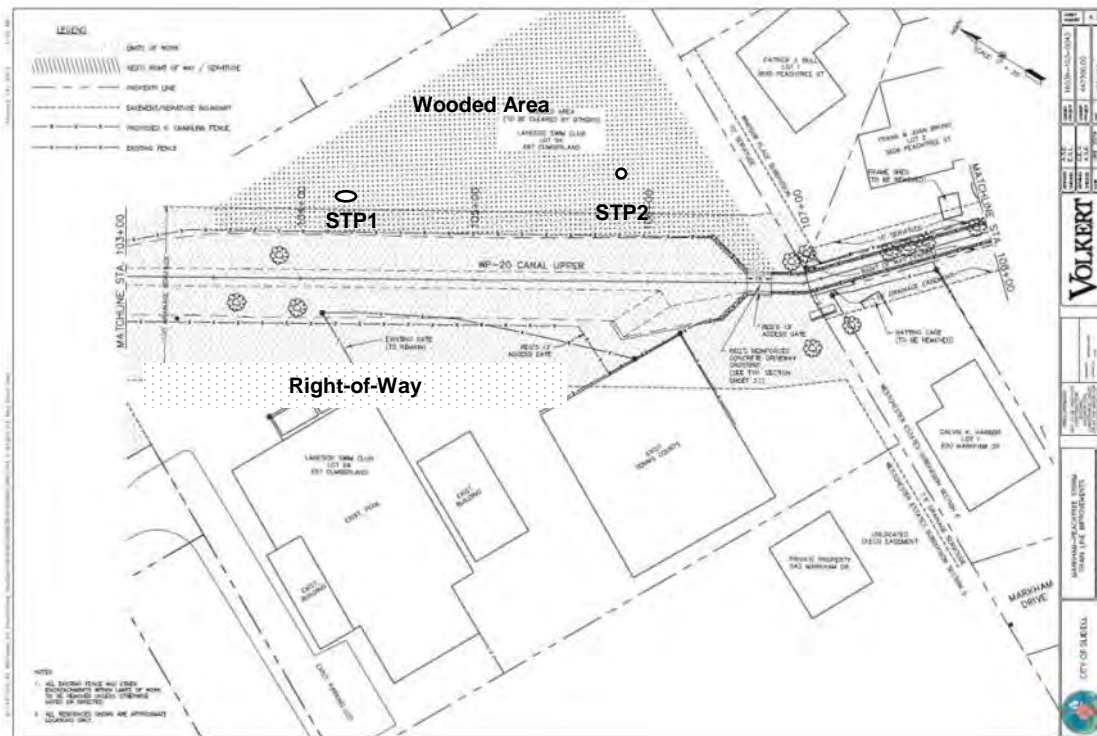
Markham-Peachtree Drainage Way: Staging Area APE shown in relation to the construction Right-of-Way (adapted from Volkert Engineering Services' construction plan).
